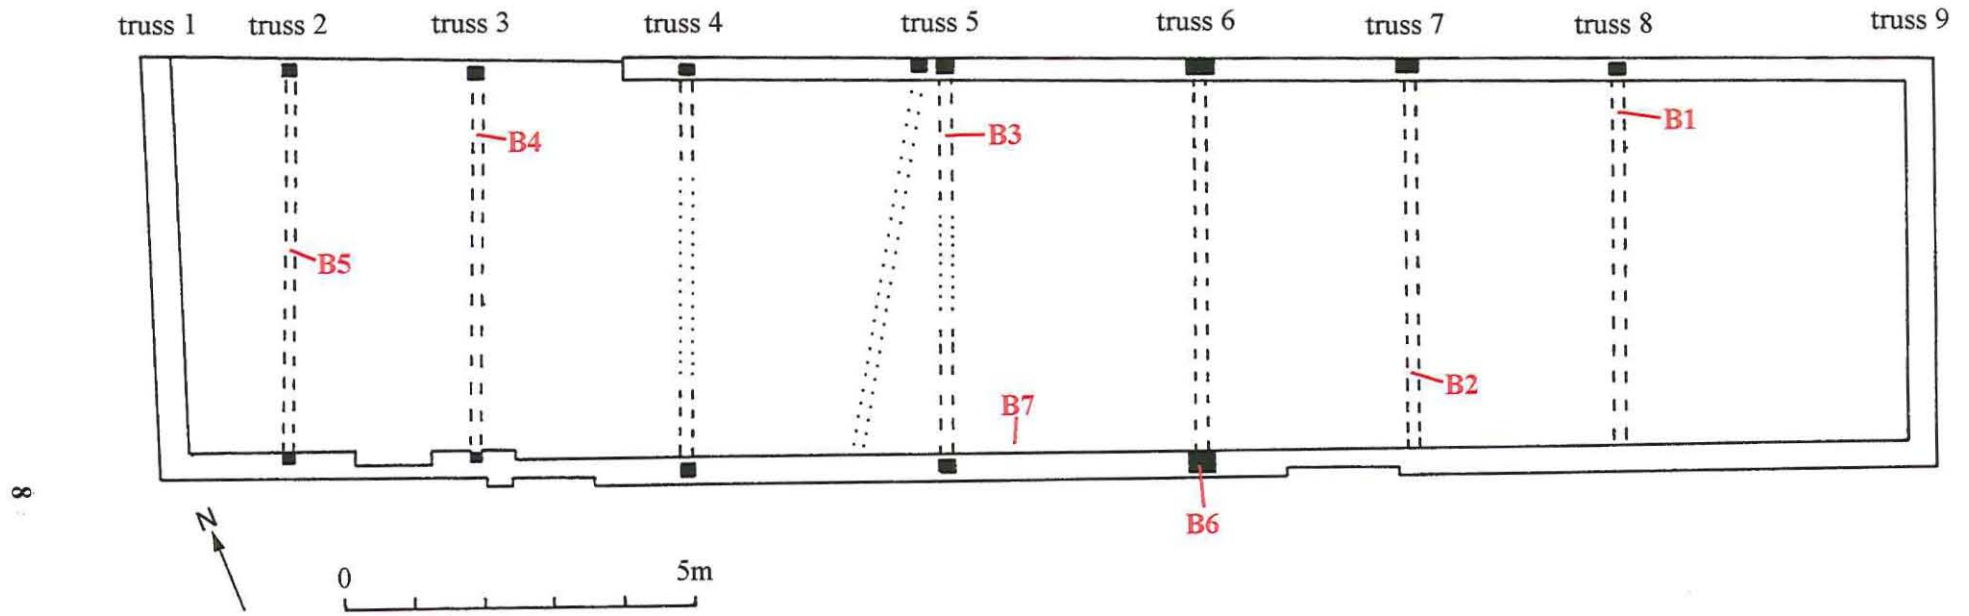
Plan of Abbey Farm cottage showing the position of the trusses
